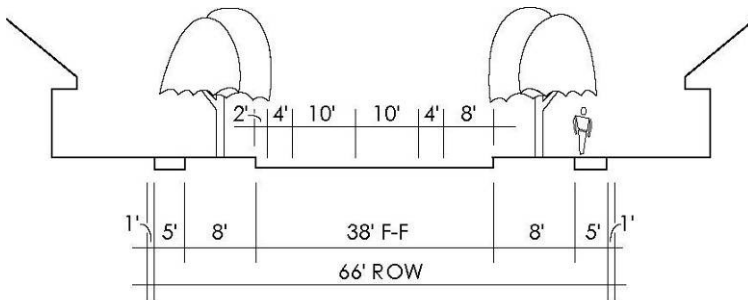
Schematic sketch of a typical collector street cross-section with one-sided parking and bike lanes.
